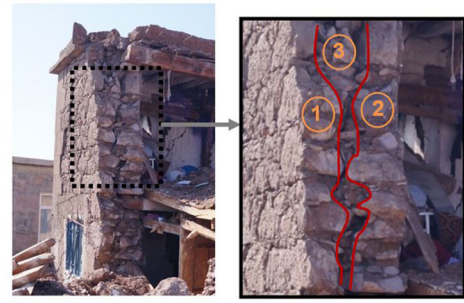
Size of the stones on the body of the external wall and ruptures in the building system.
